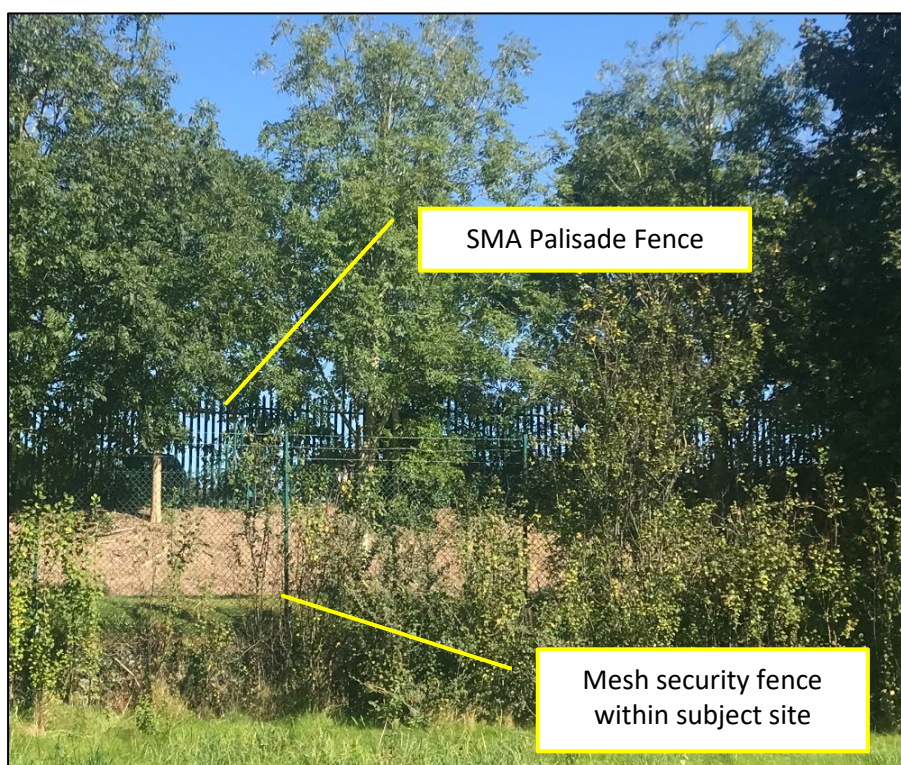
Image of existing northern boundary treatments on site when viewed from inside the subject site, facing north. [Source: TPA 2023]
